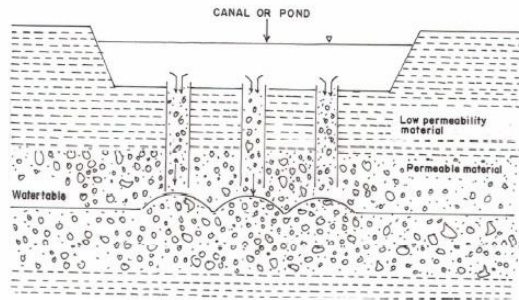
SCHEMATIC DRAWING OF A RECHARGE SHAFT
